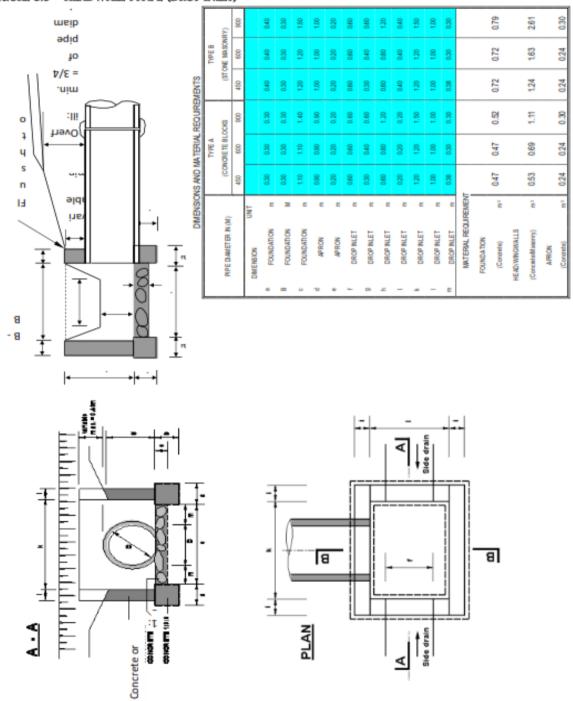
HEADWALL TYPE 3A (CONCRETE BLOCK HEADWALLS)
